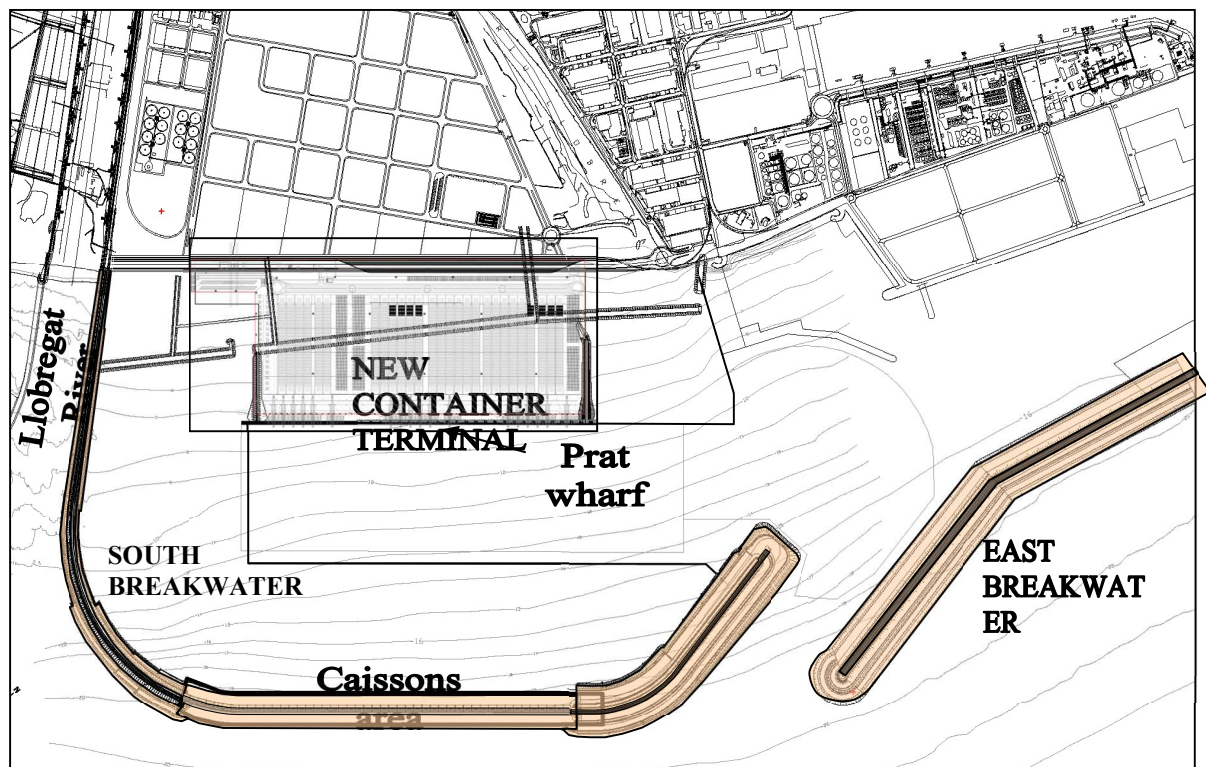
Plant view of the new breakwaters at the Port of Barcelona.
